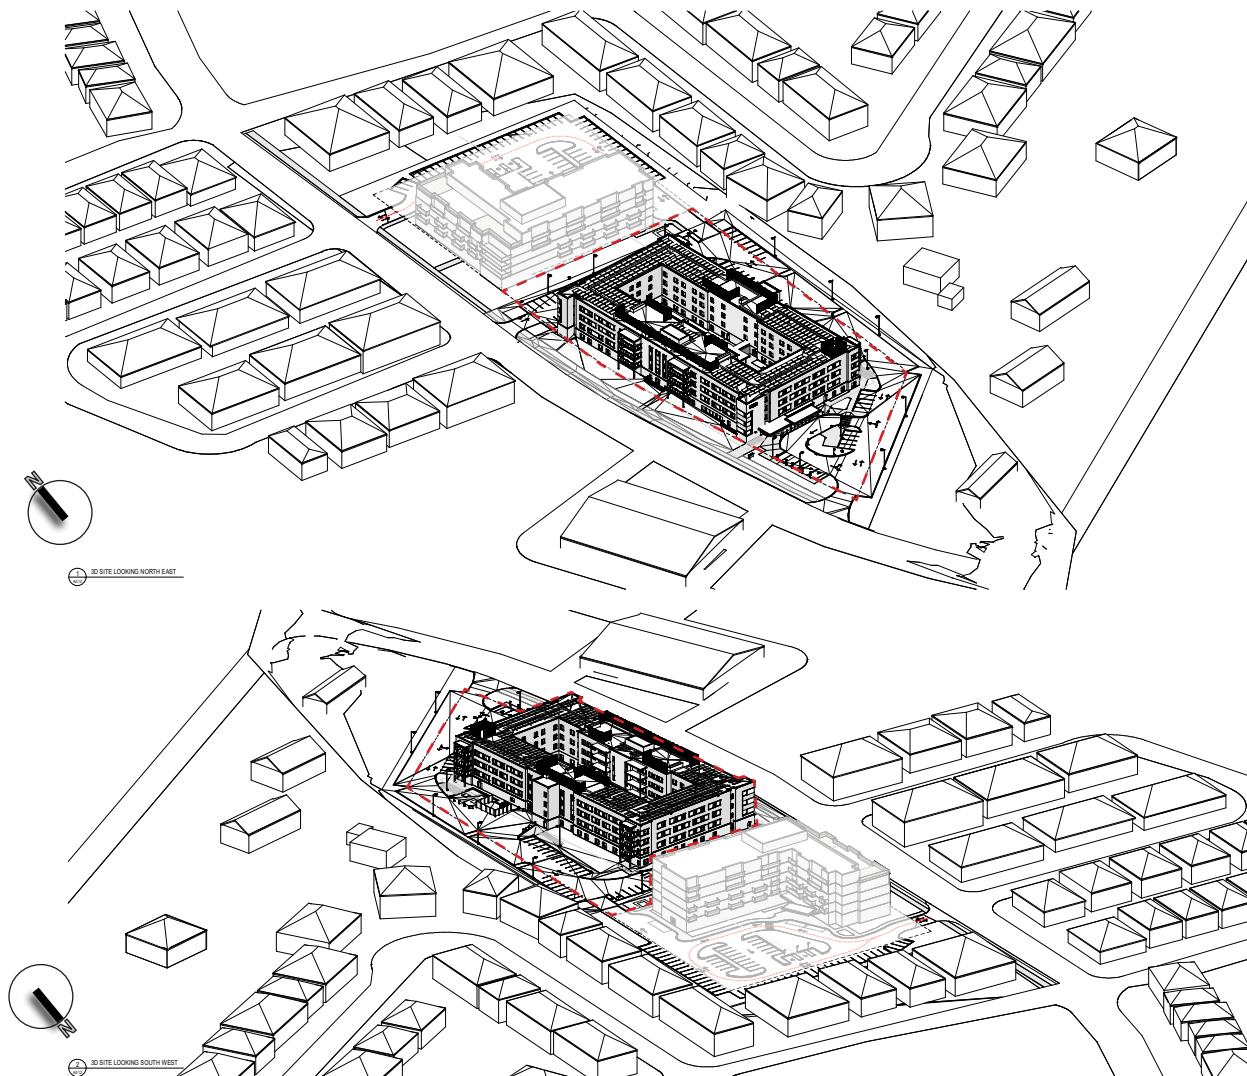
Bird's Eye perspective looking northeast (top) and southwest (bottom) illustrating the entire height and width of the building
